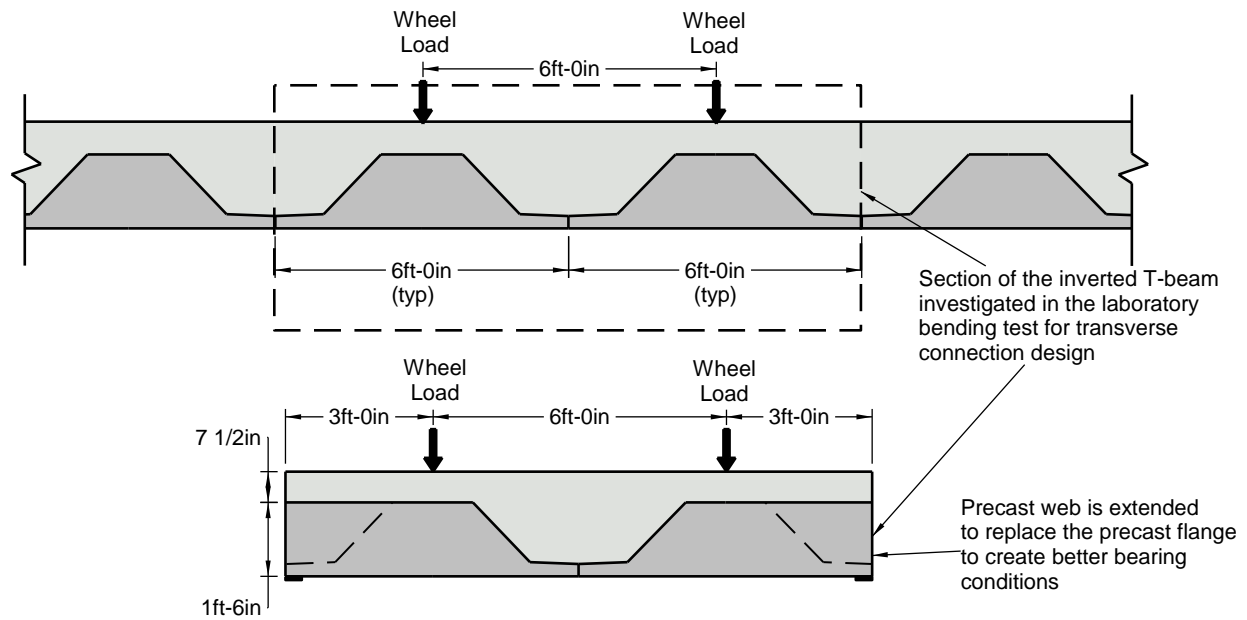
Virginia Inverted T-Beam Sub-assembly Specimen as Section of a Larger Bridge Assembly
